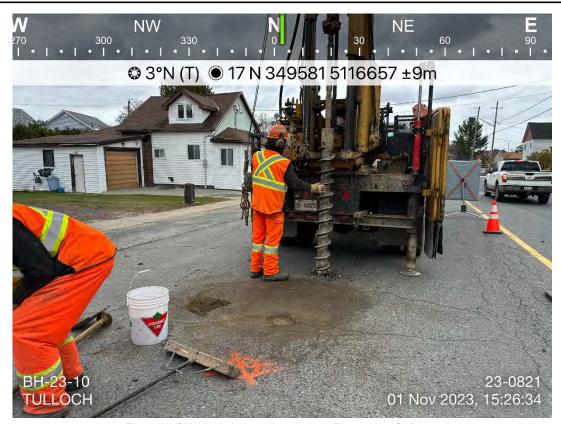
BH-23-10 during advancement. Photo taken facing north.
